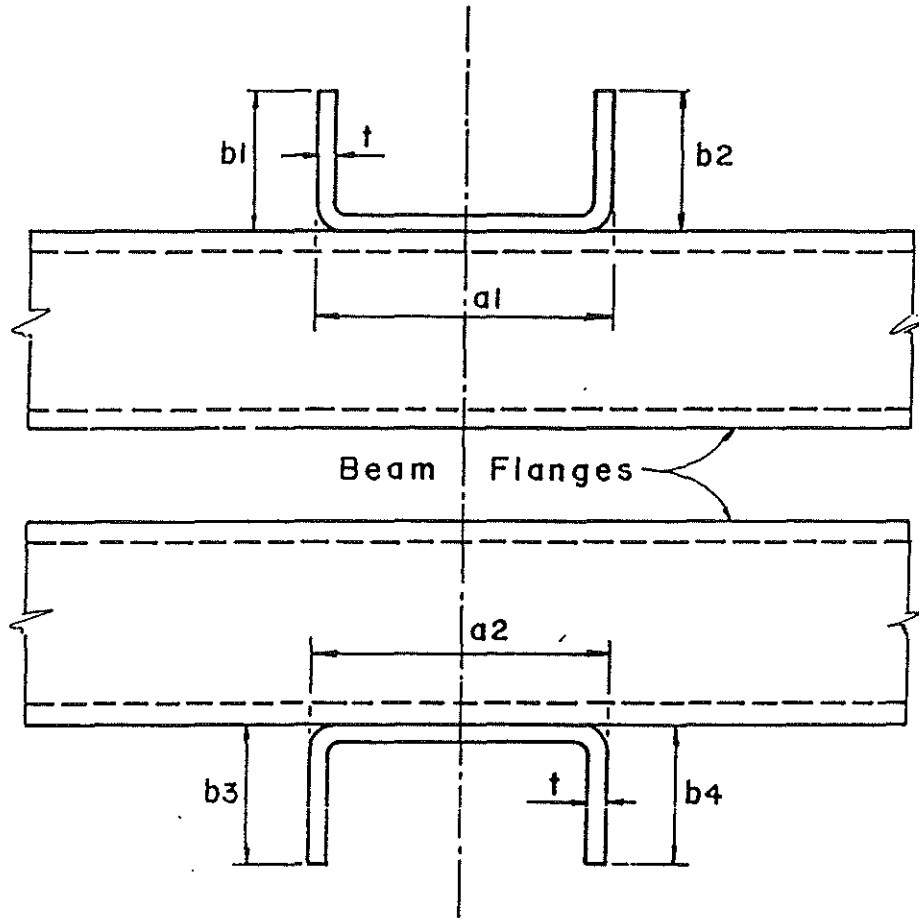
Dimensions of Cold-Formed Steel Transverse Stiffeners
